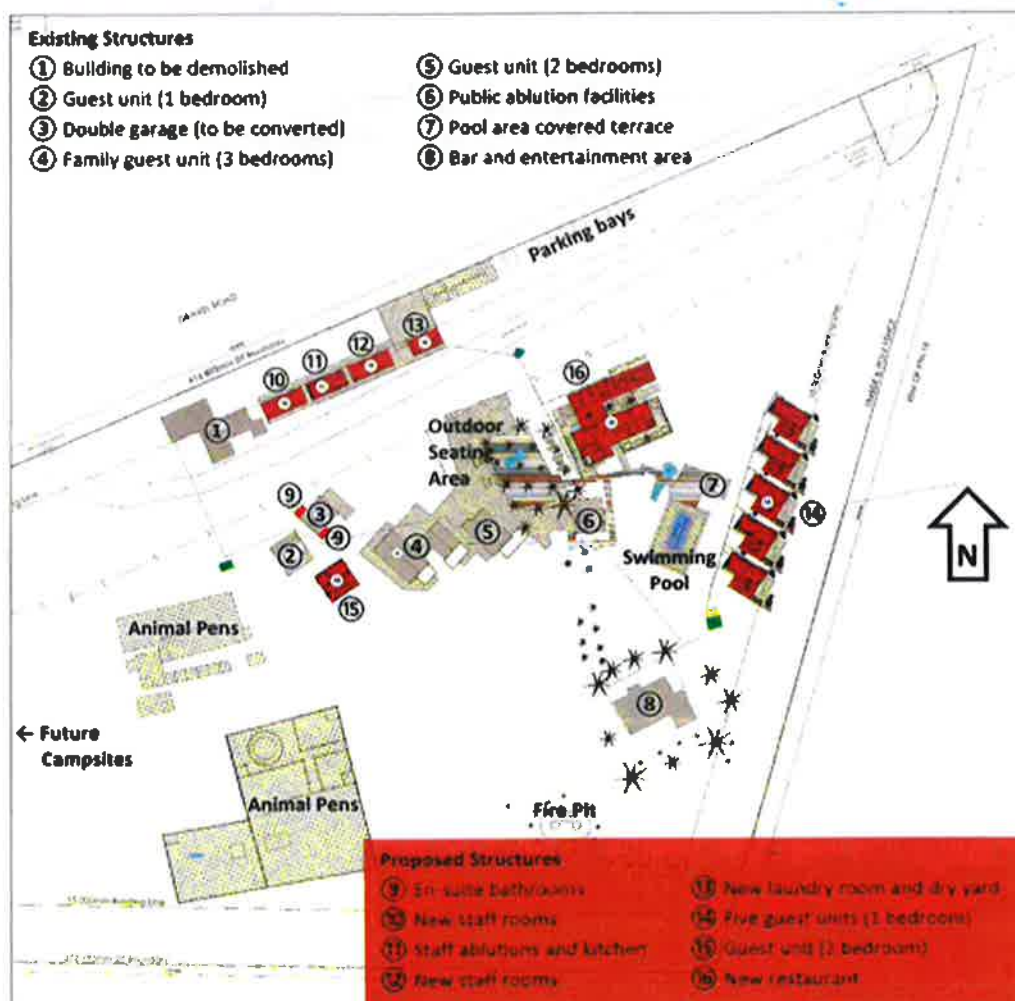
Plan dated 4 August 2022 depicting existing buildings in grey and proposed buildings in red (Credit: Konsep Architectural Design Consulting Studio).
